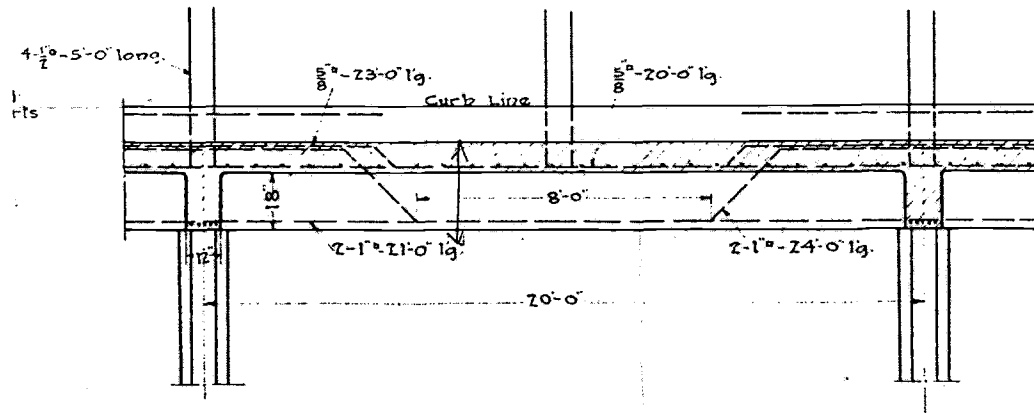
Typical Steel Reinforcement Details in Longitudinal Beams
